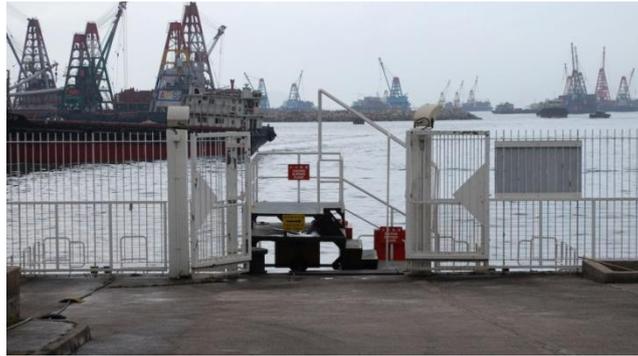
Plank Hoist at Yau Ma Tei
